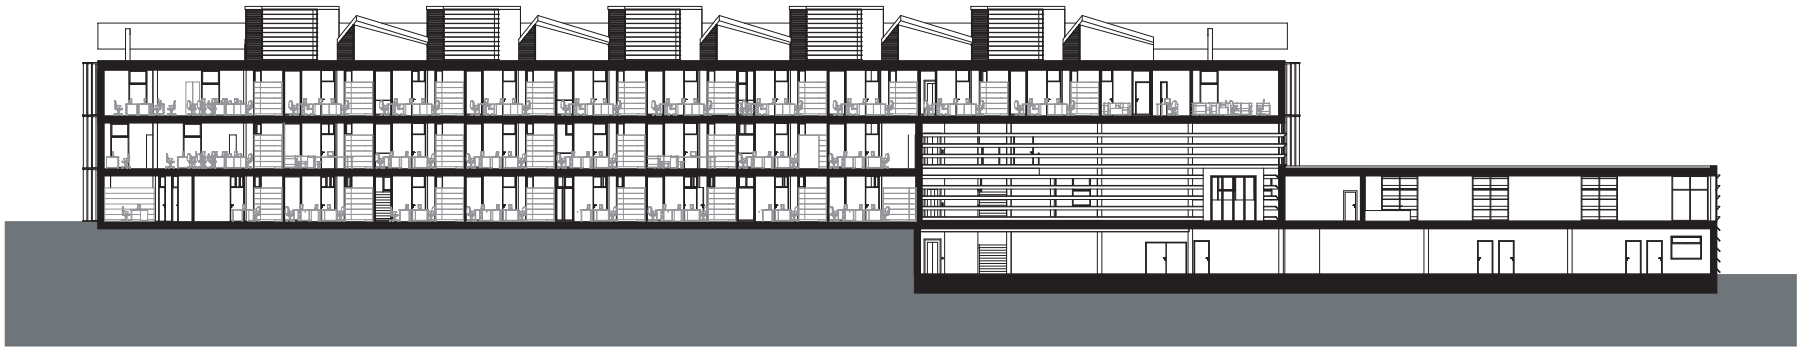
East-west section of the New Generation Office Building (Scale 1:500)
